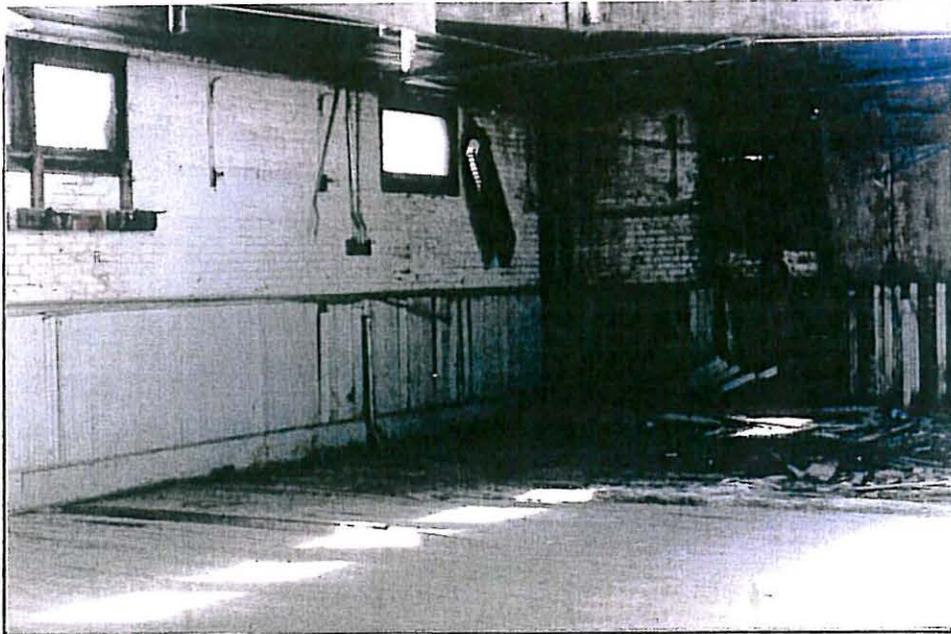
Moisture induced damages to ceiling, wall, and floor finishes and structure, southeast corner room 201
